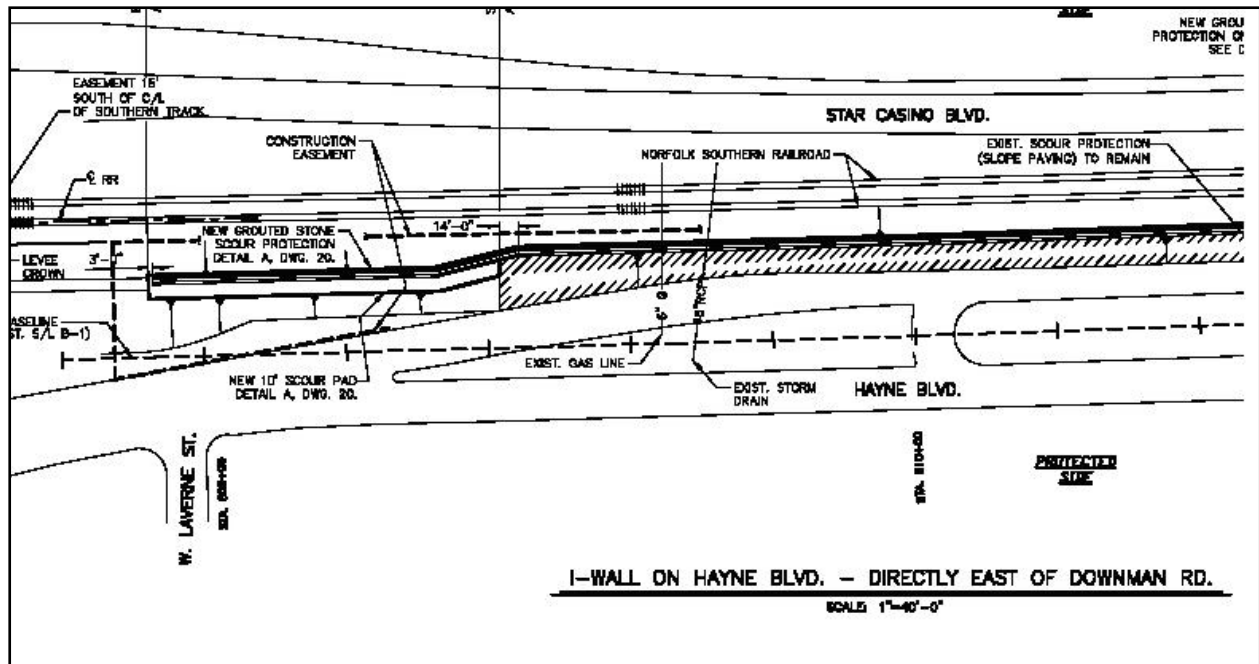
NOE7_D Above Picture Plan View from NOE10 Reconstruction Solicitation Drawings
